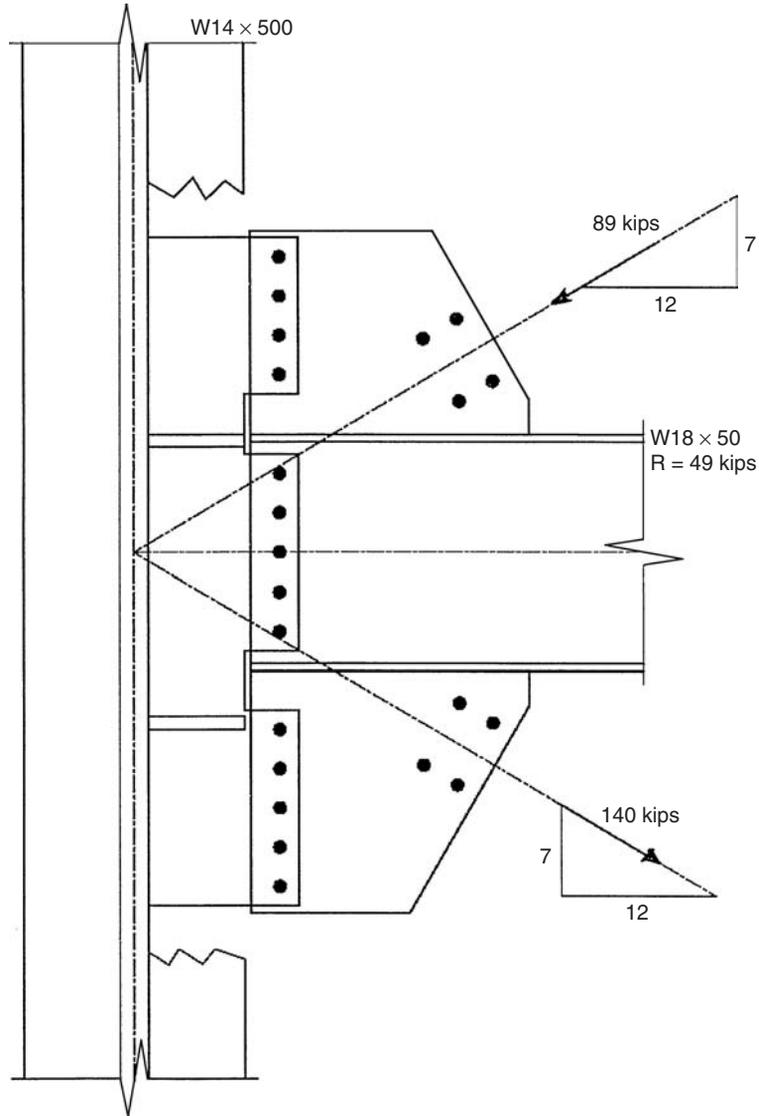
Vertical bracing using an extended single-plate connection.
